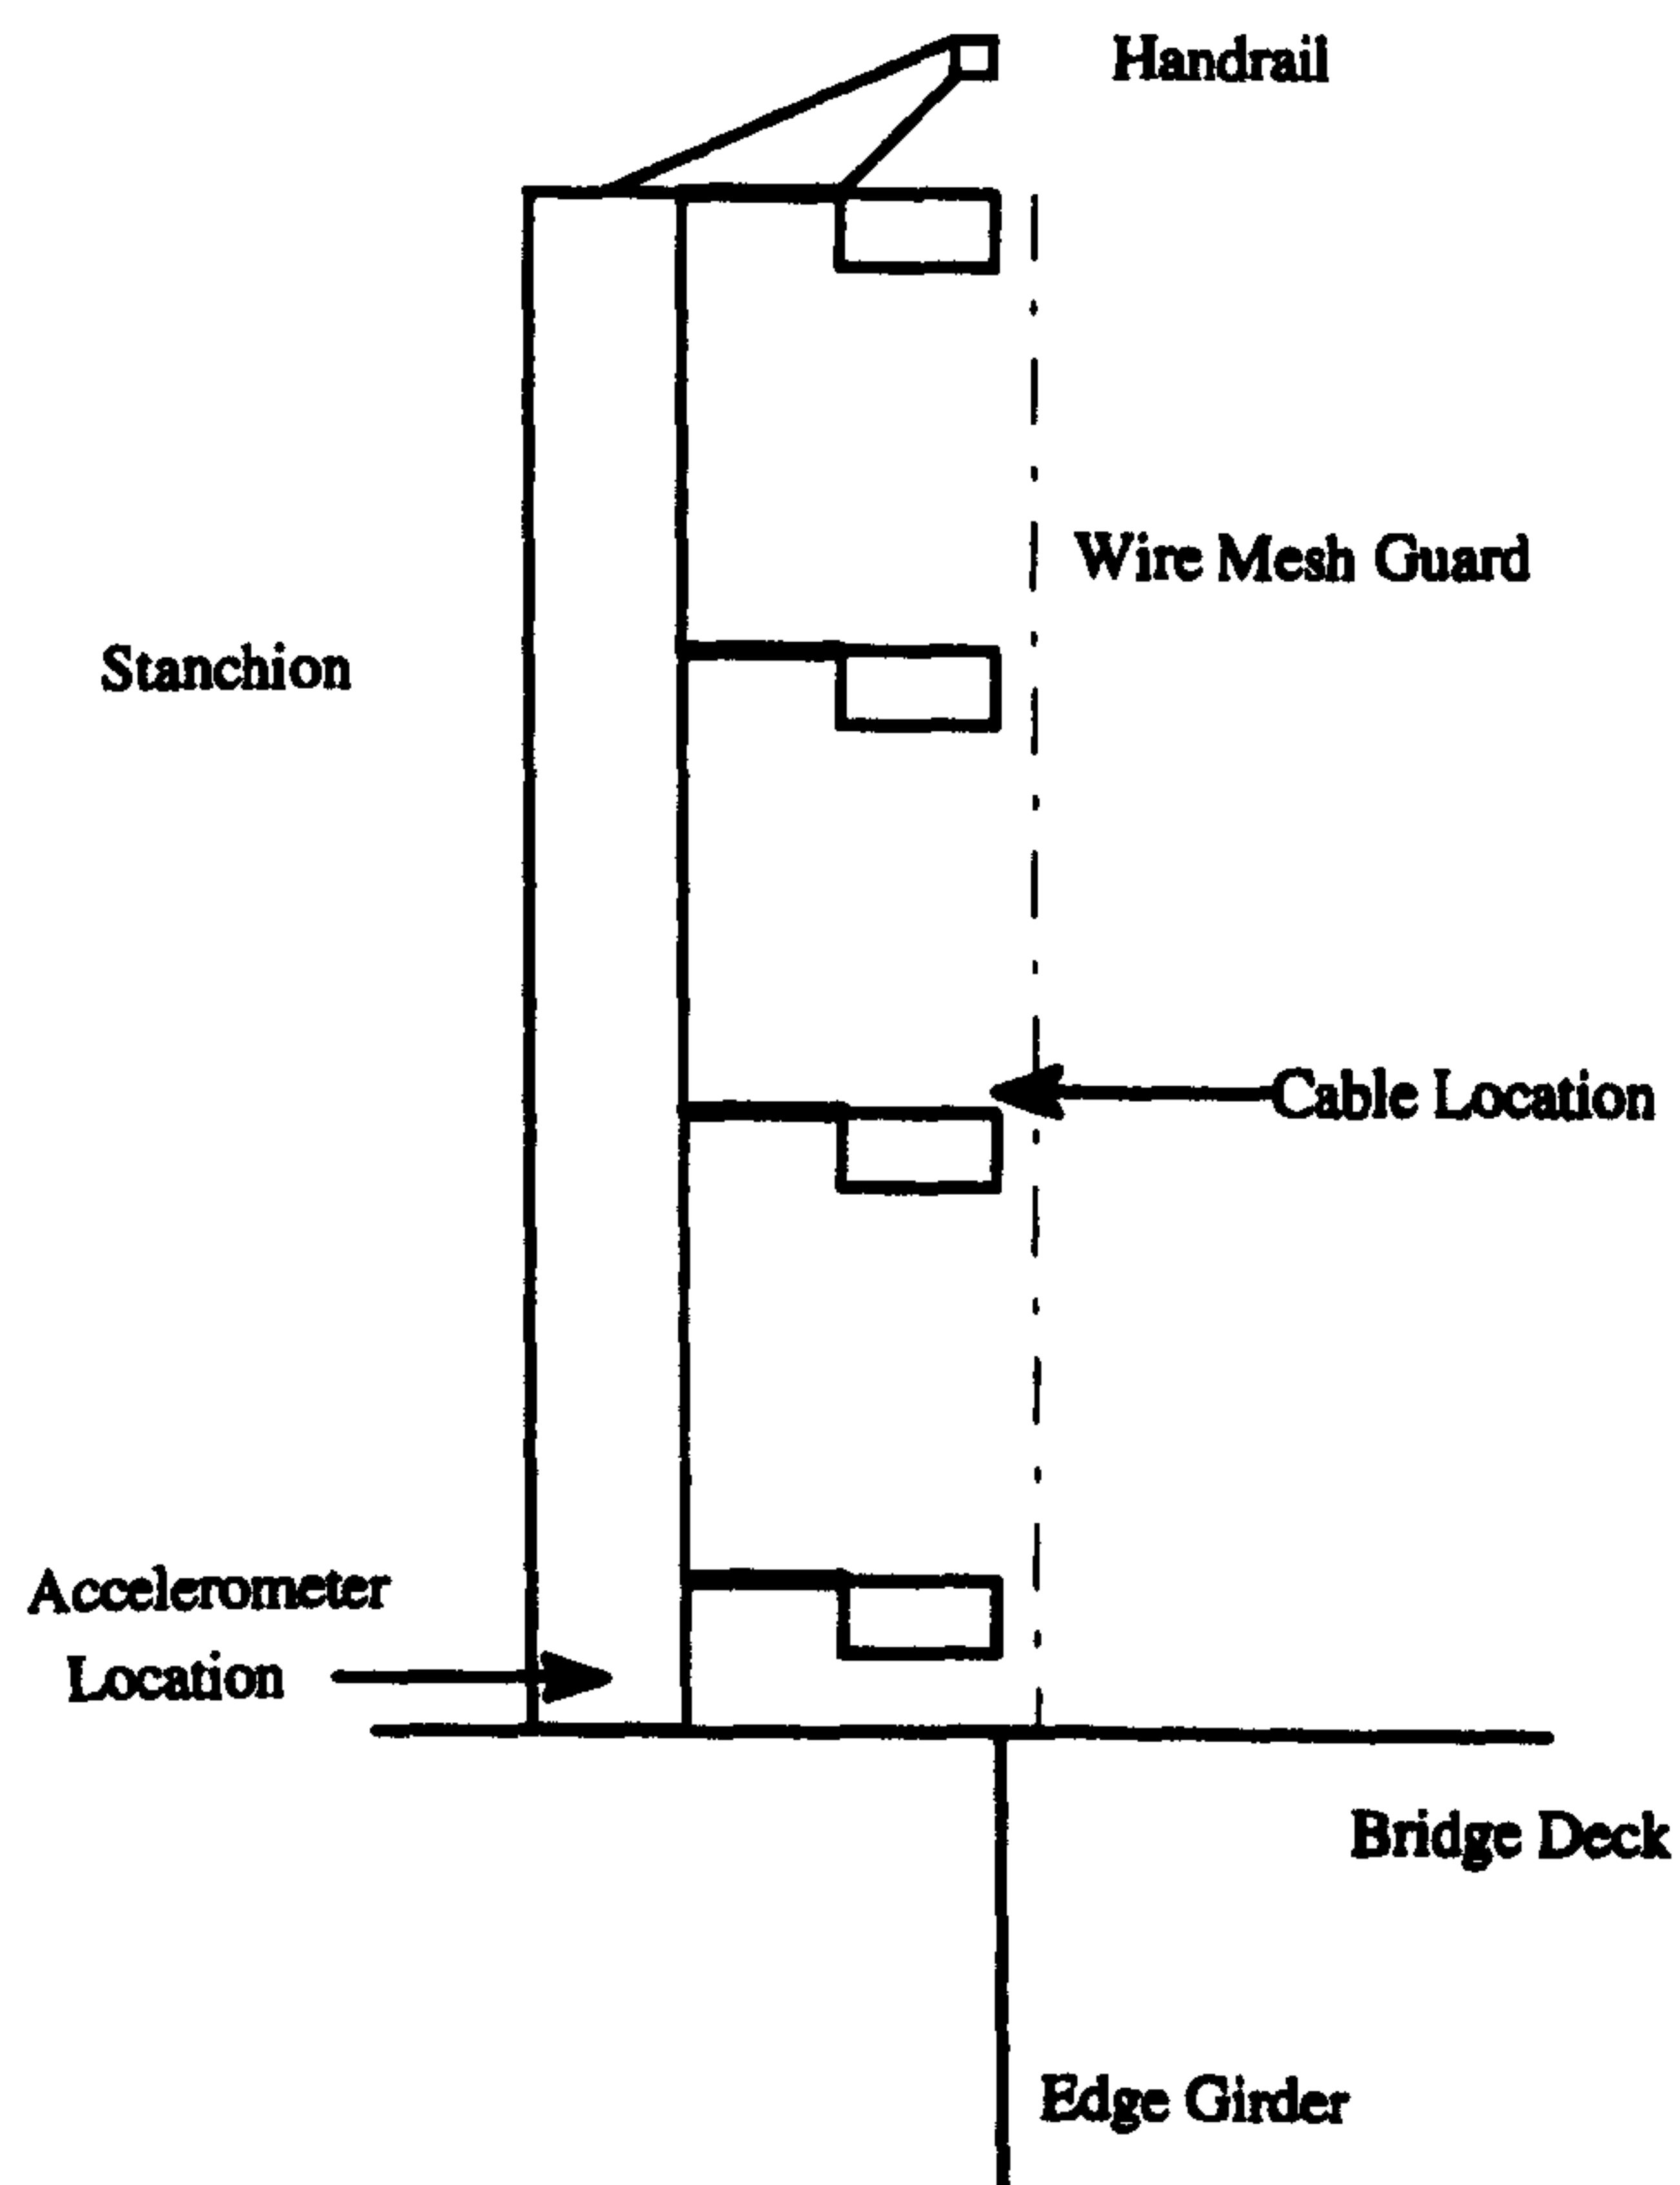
Mounting of Accelerometers and Cabling on Bridge Deck
